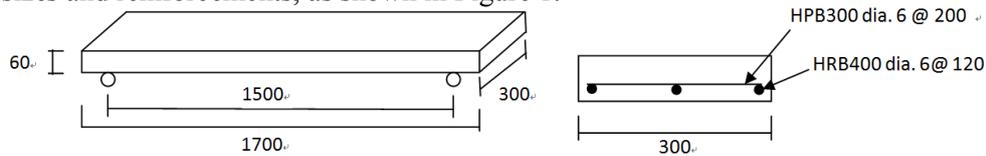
Geomatic sizes of precast NAC and RAC slabs.
